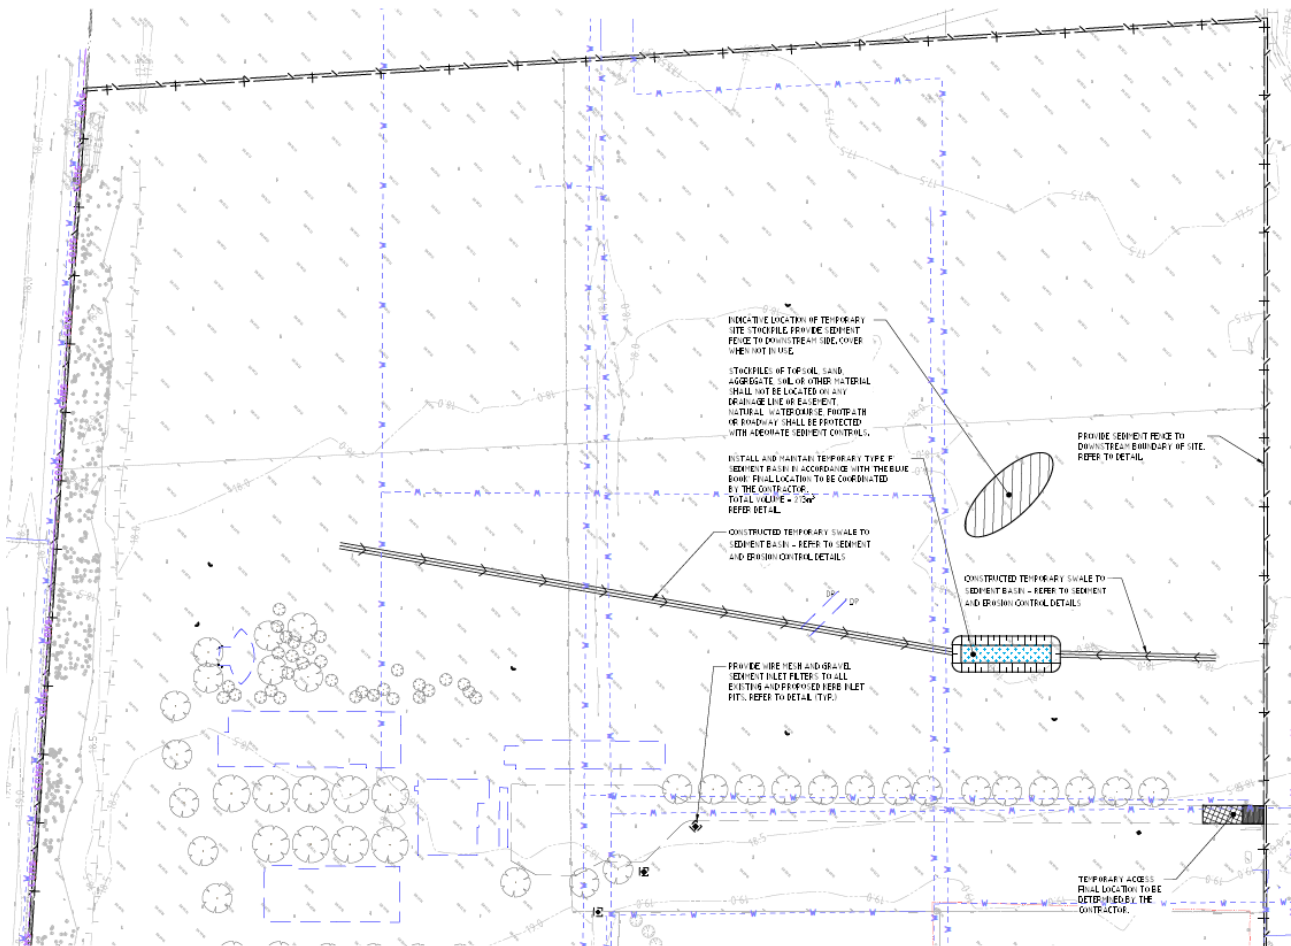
Soil and Erosion Control Plan (source: Northrop)
